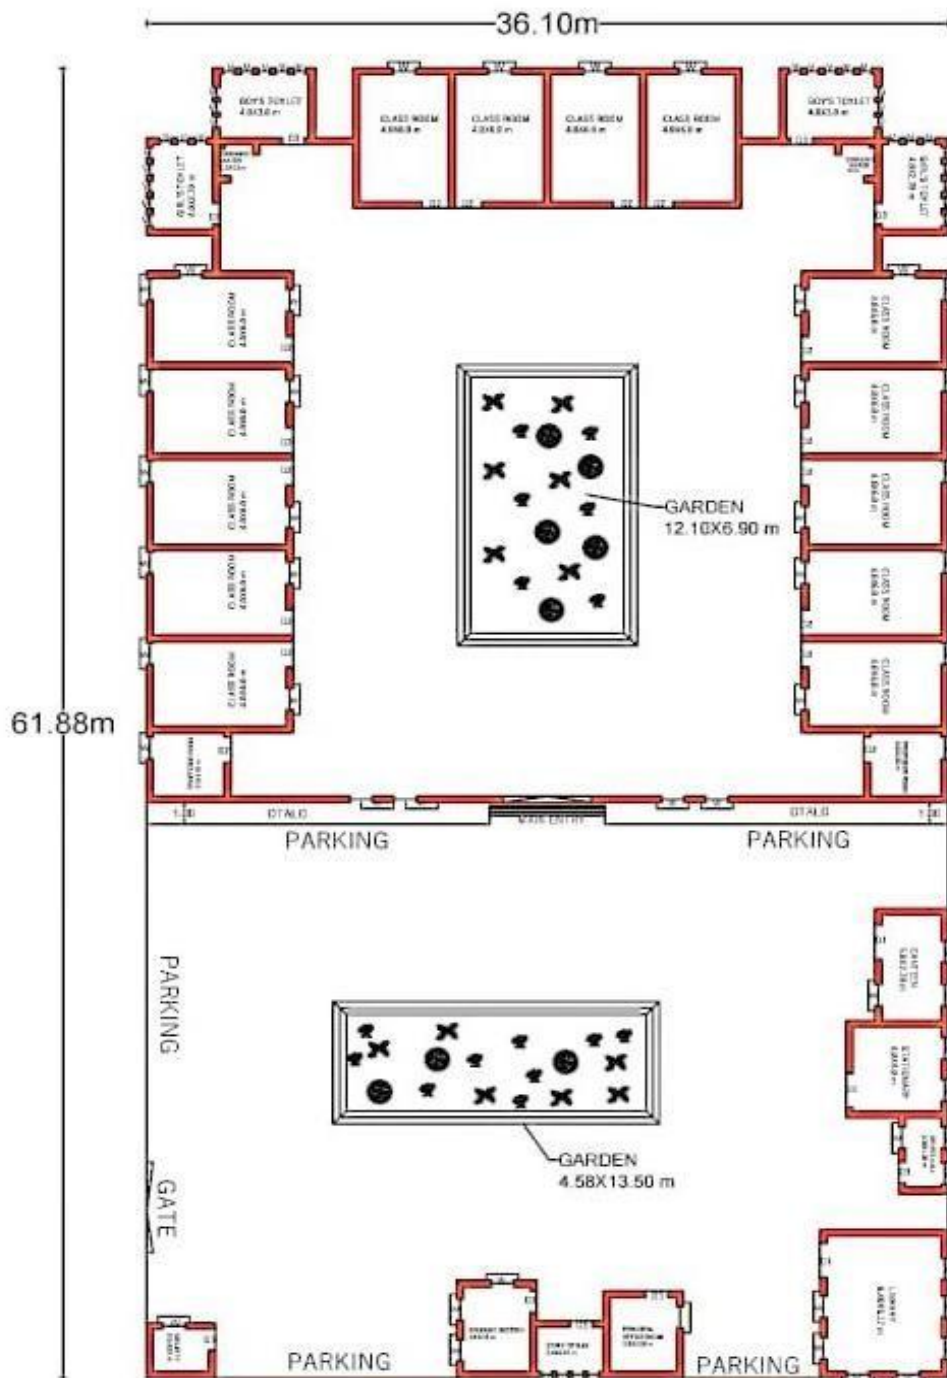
DESIGN LAYOUT OF SCHOOL BUILDING
